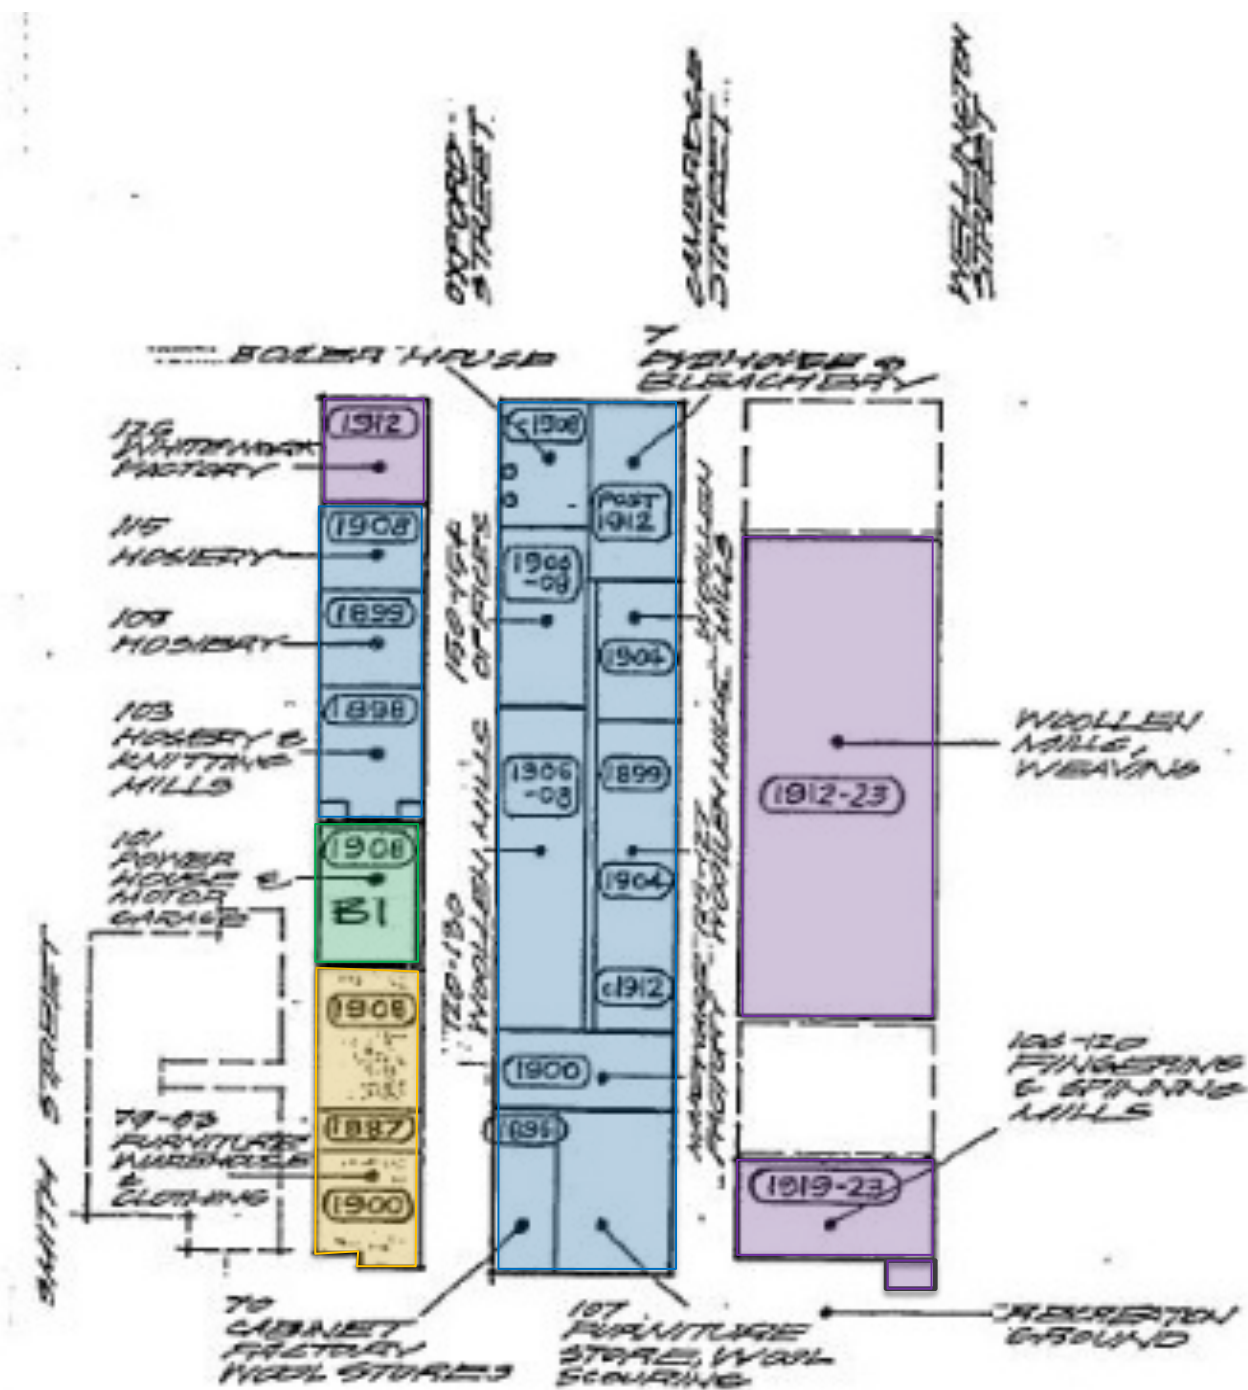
Existing extent of VHR Registration with proposed additional land and building shaded in purple (Adapted from Andrew C Ward & Associates, *Foy and Gibson's Manufacturing Complex: submission to the Historic Buildings Council* (August 1989))
